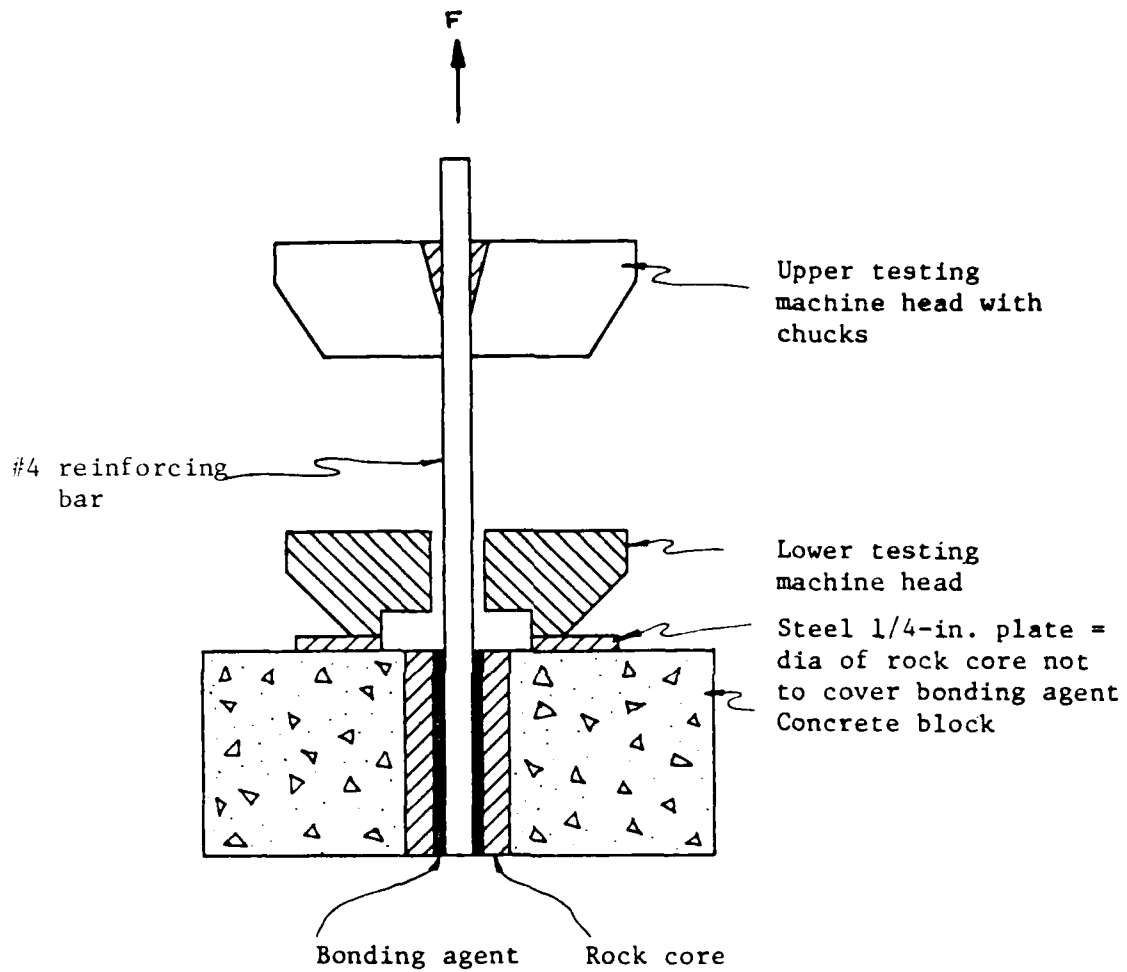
Section showing test configuration for the reinforcing bar pullout tests
